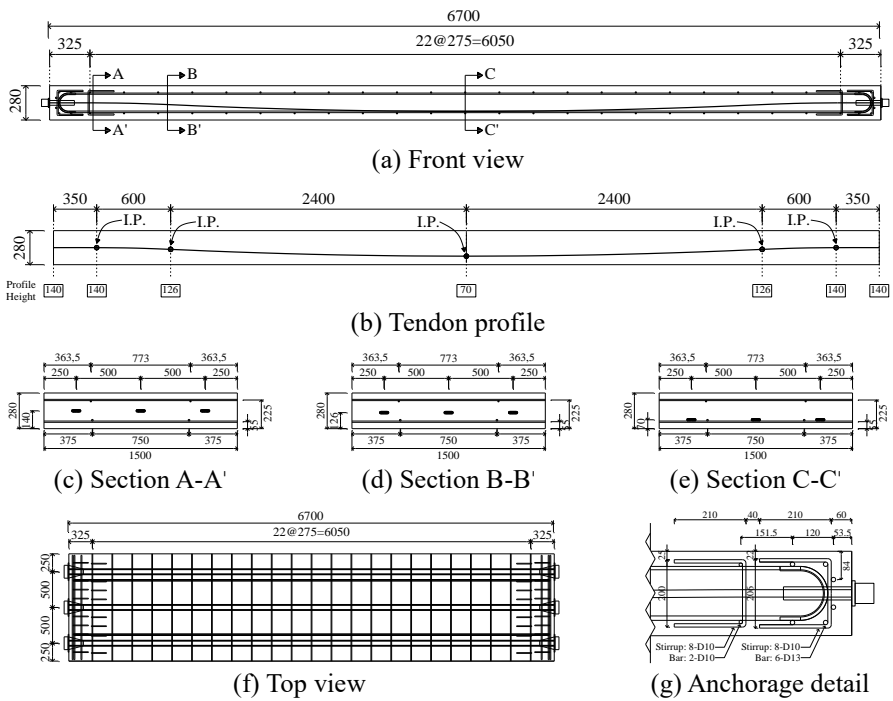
Details of Specimen PF-B3 (unit: mm)
